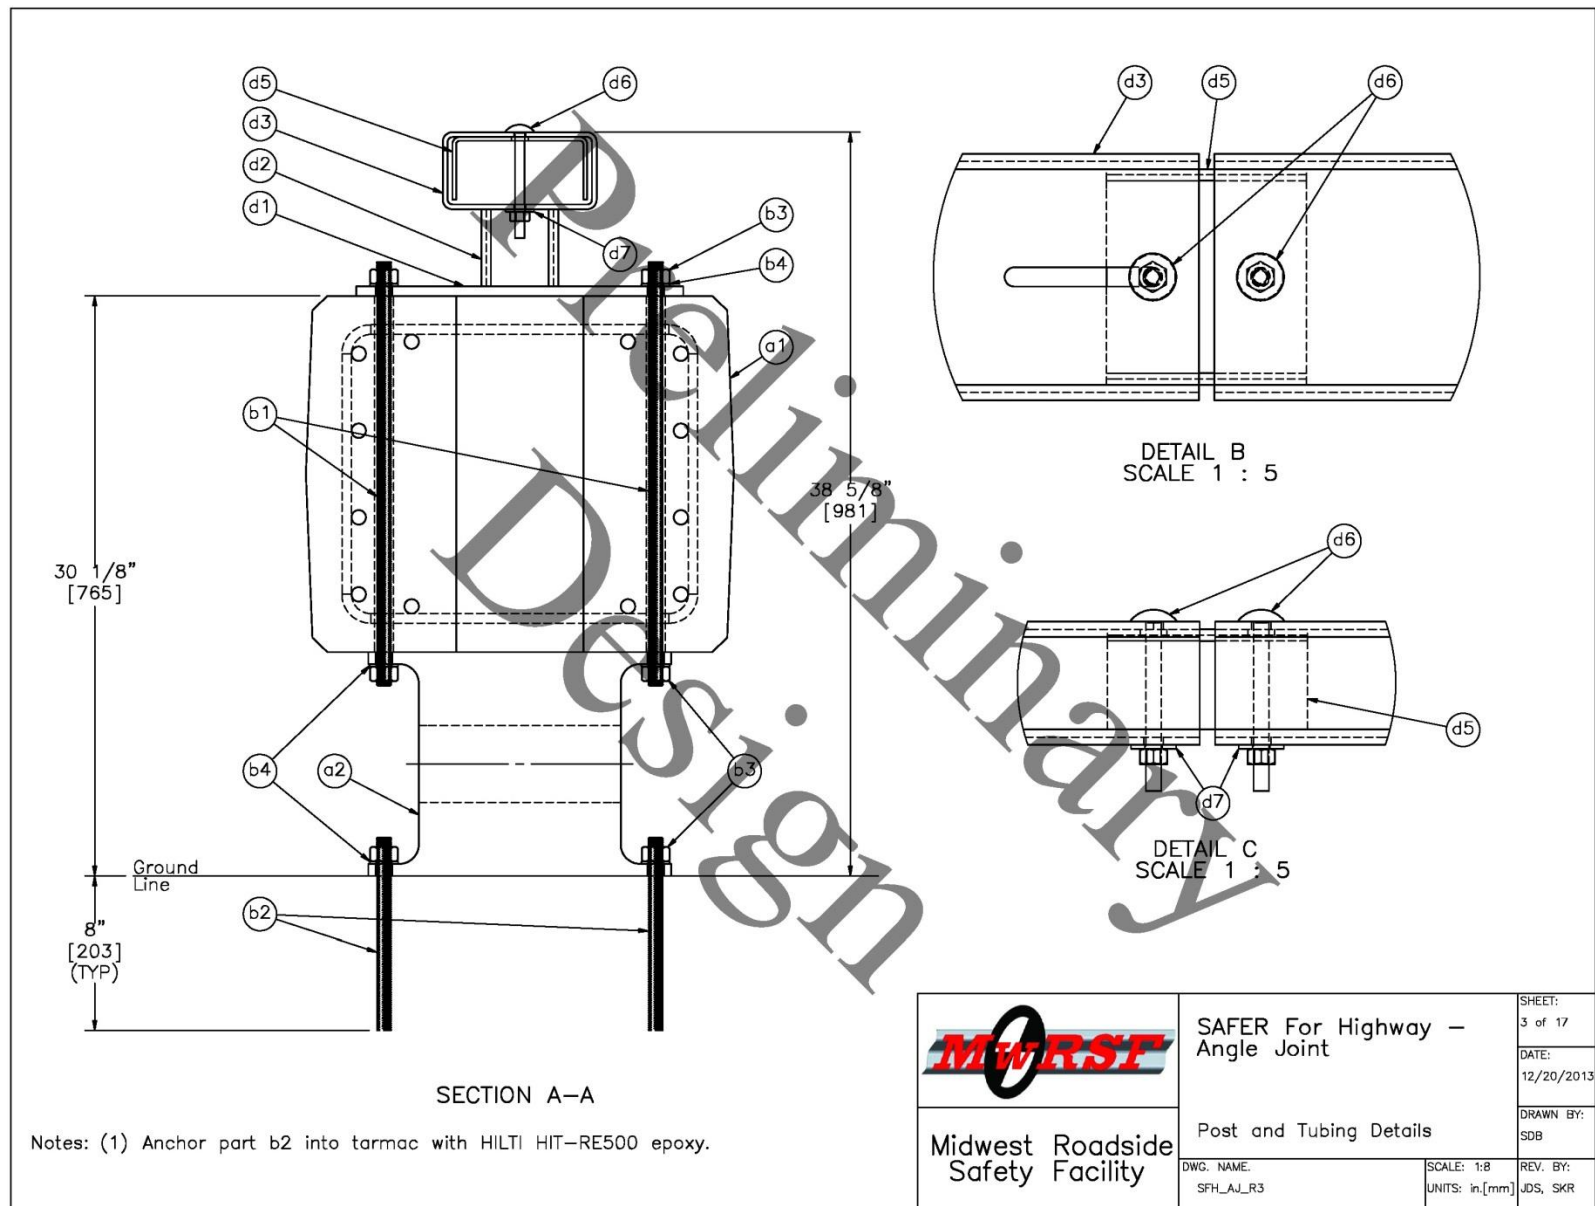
Preliminary Barrier Design, Post and Tubing Details
